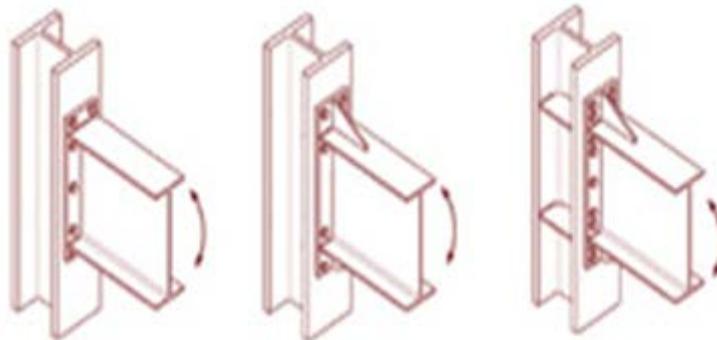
Bolted Un-stiffened and Stiffened Extended End-Plate Moment Connections
